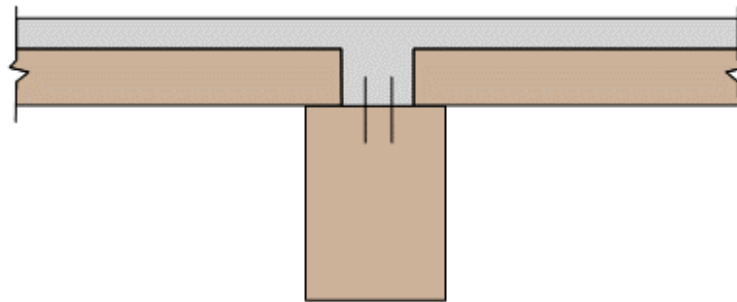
Timber-concrete composite beam section (courtesy of Aspect Structural Engineers).
